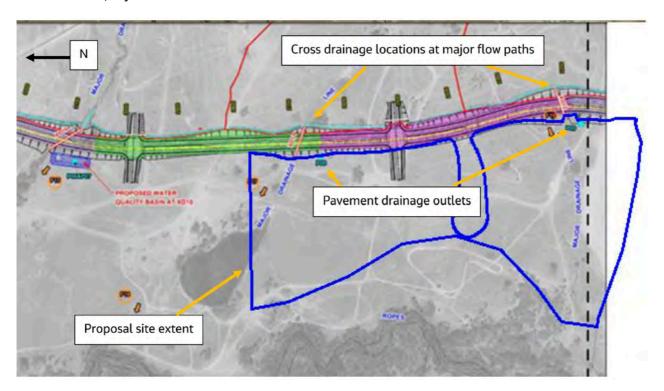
Excerpt of concept drainage strategy from *Archbold Road Flooding and Drainage* (Lyall & Associates, 2016)
